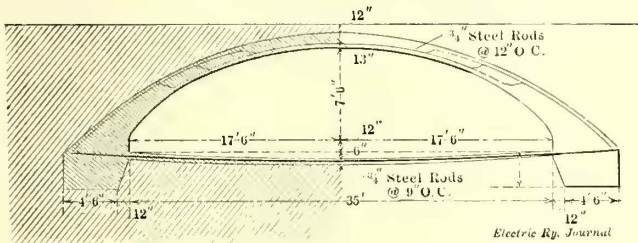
Bridge Reconstruction on the Columbus & Lake Michigan Railway—Cross-section of Bridge 401
